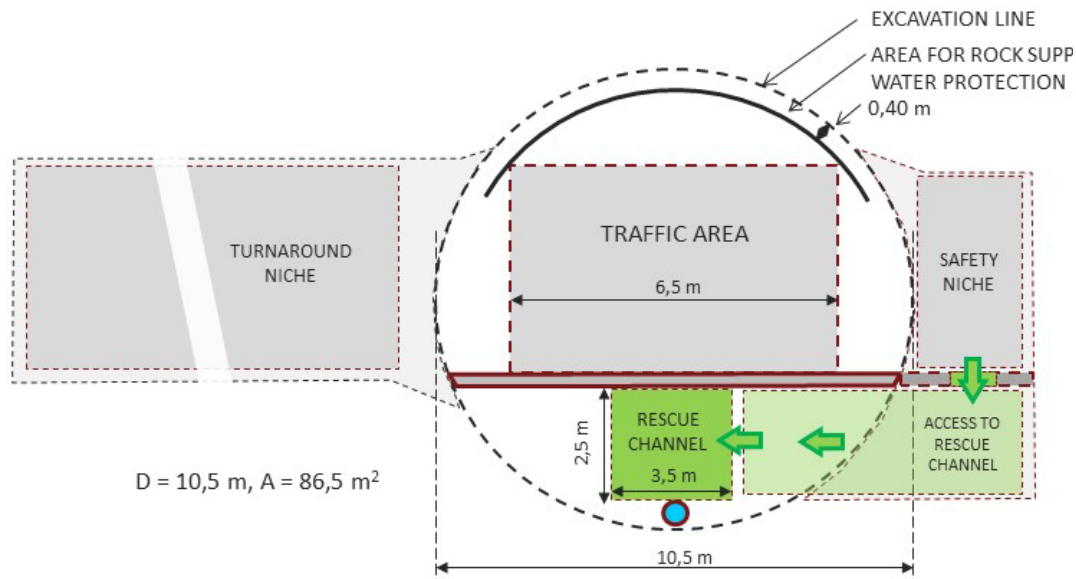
Option with TBM excavation, excavation section indicating the necessary additional areas for safety niches, turnaround niches and possible location of rescue channel. Vertical cross section.
